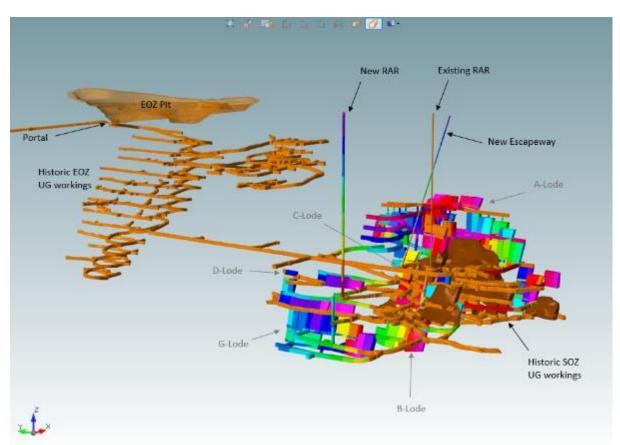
SOZ Mine Plan showing previous underground development (orange) and stoping (brown)
